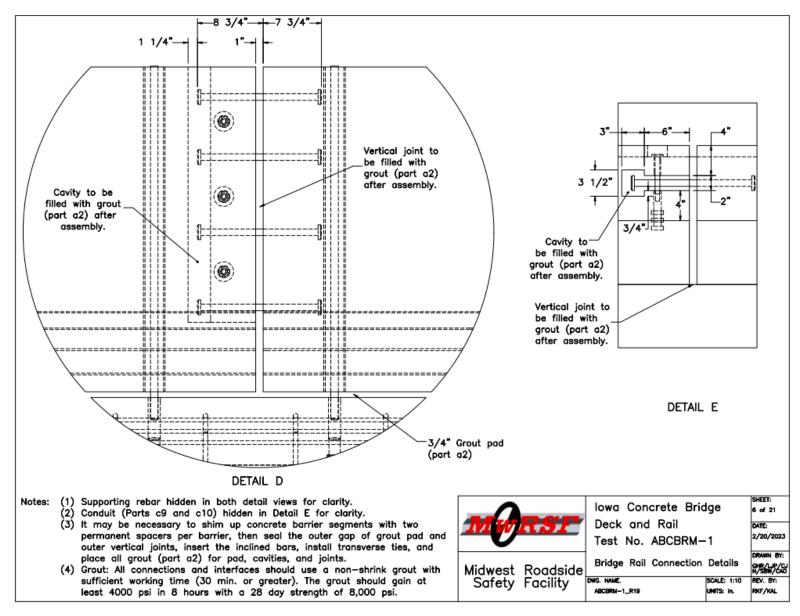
Bridge Rail Connection Details, Test No. ABCBRM-1
